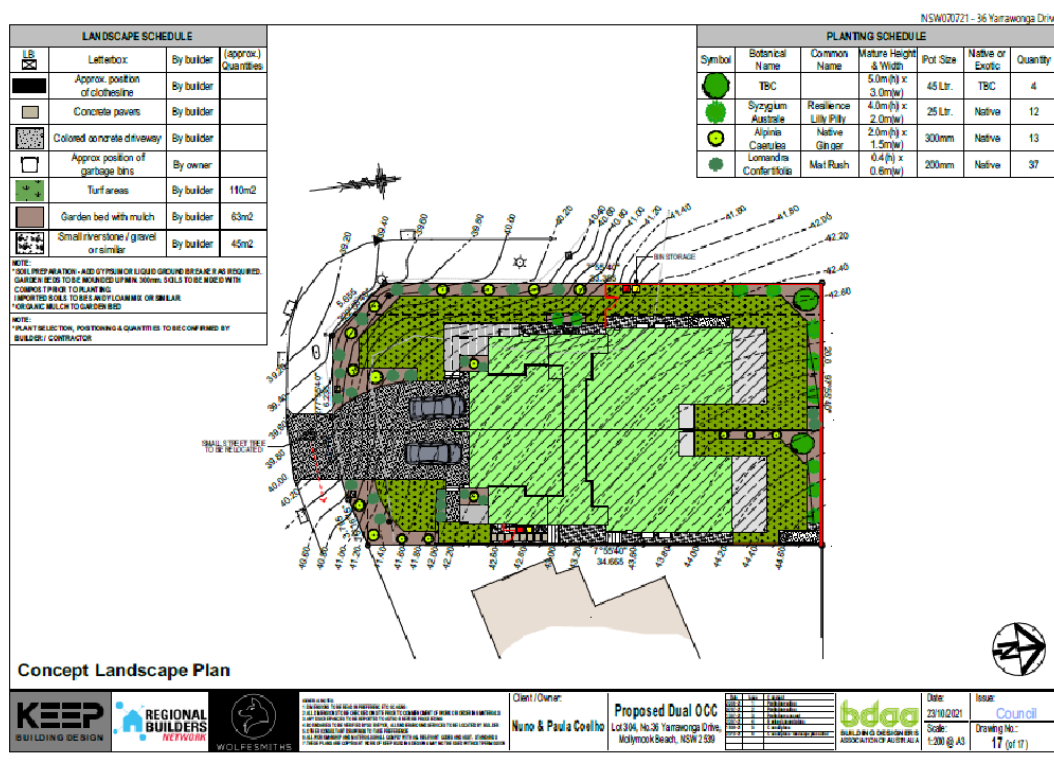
Landscape Plan - 36 Yarrowonga Dr, Mollymook Beach
